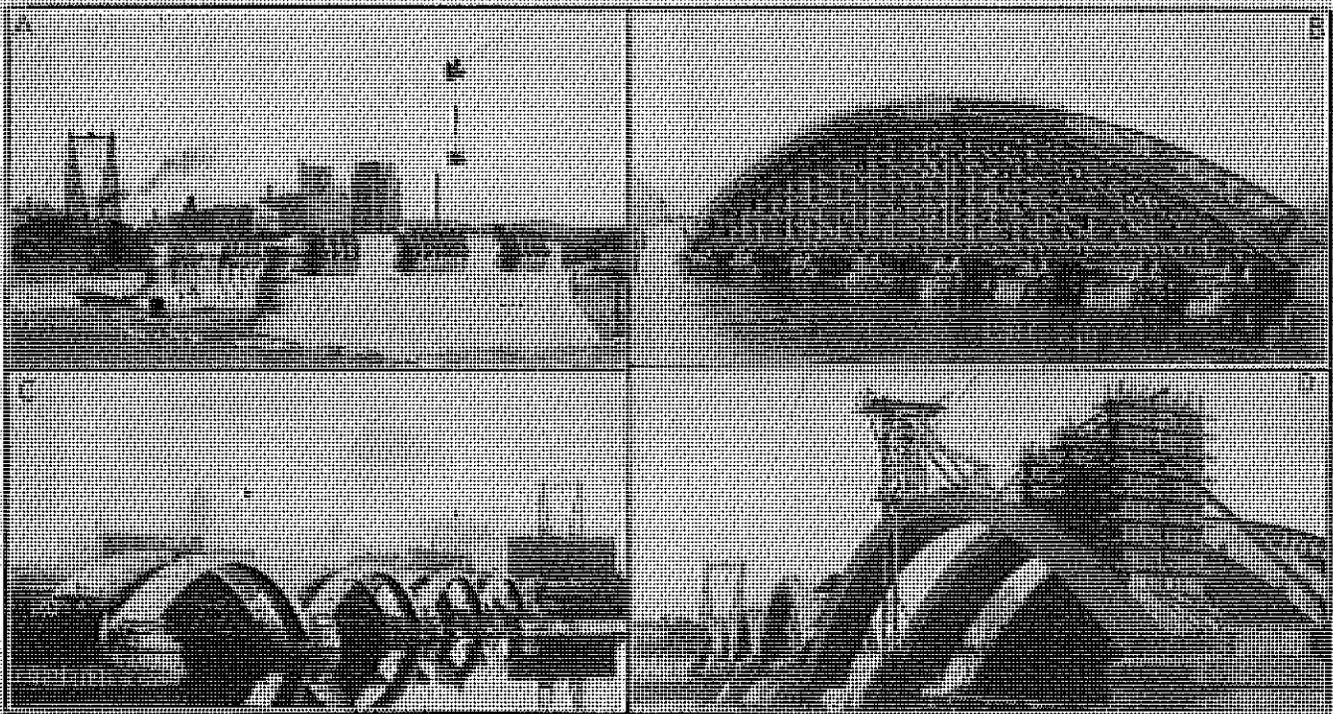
CONSTRUCTION OF REINFORCED-CONCRETE ARCH BRIDGE OVER MISSISSIPPI RIVER AT THIRD AVE., MINNEAPOLIS, MINN.
